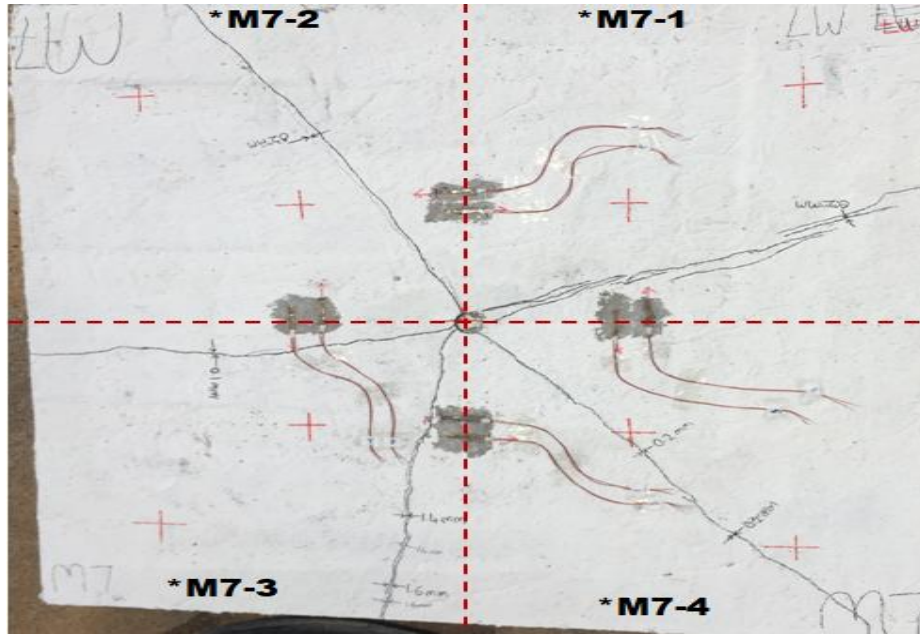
Failure for Slab Specimen M7 (2m drop) – another plan view
